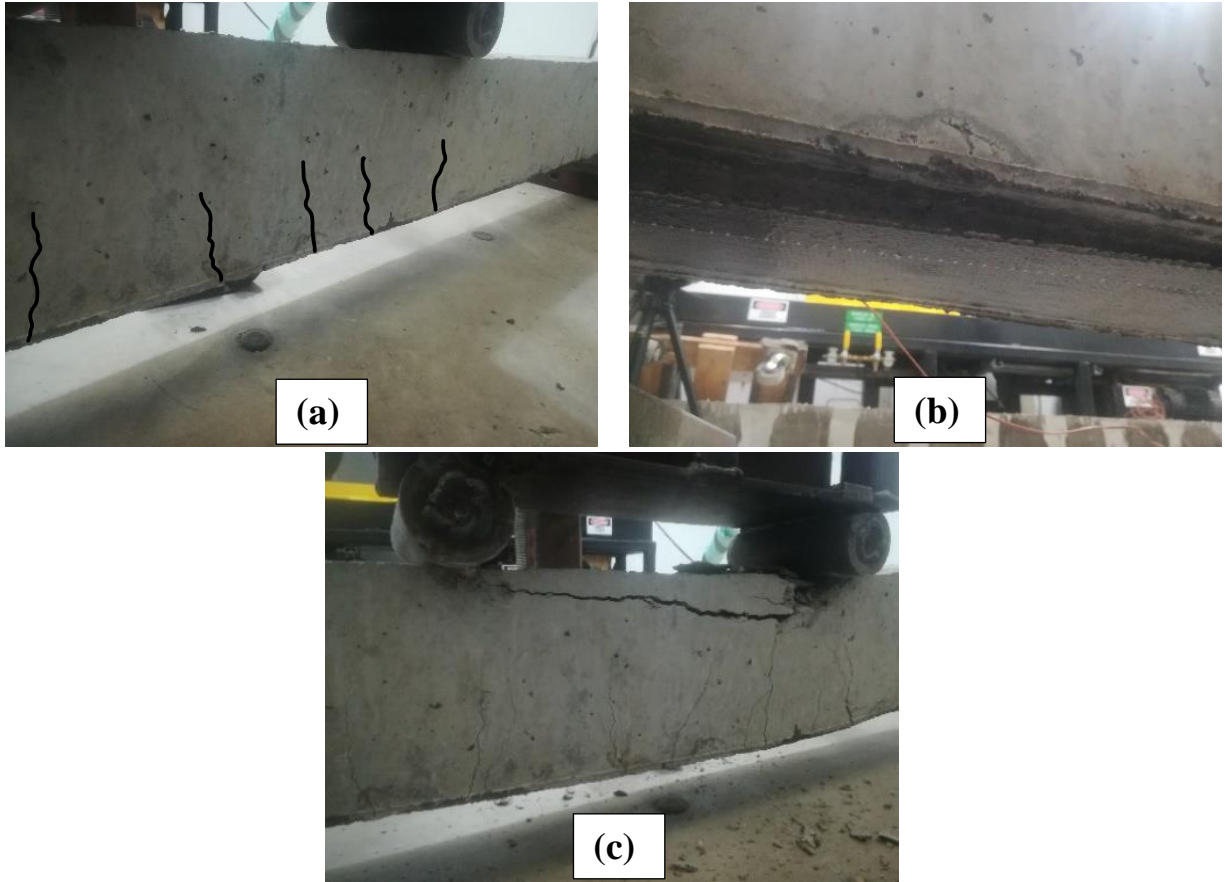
SBLCT beam failure; (a) Flexural cracks, (b) Debonding of longitudinal FRP, (c) concrete crushing.
